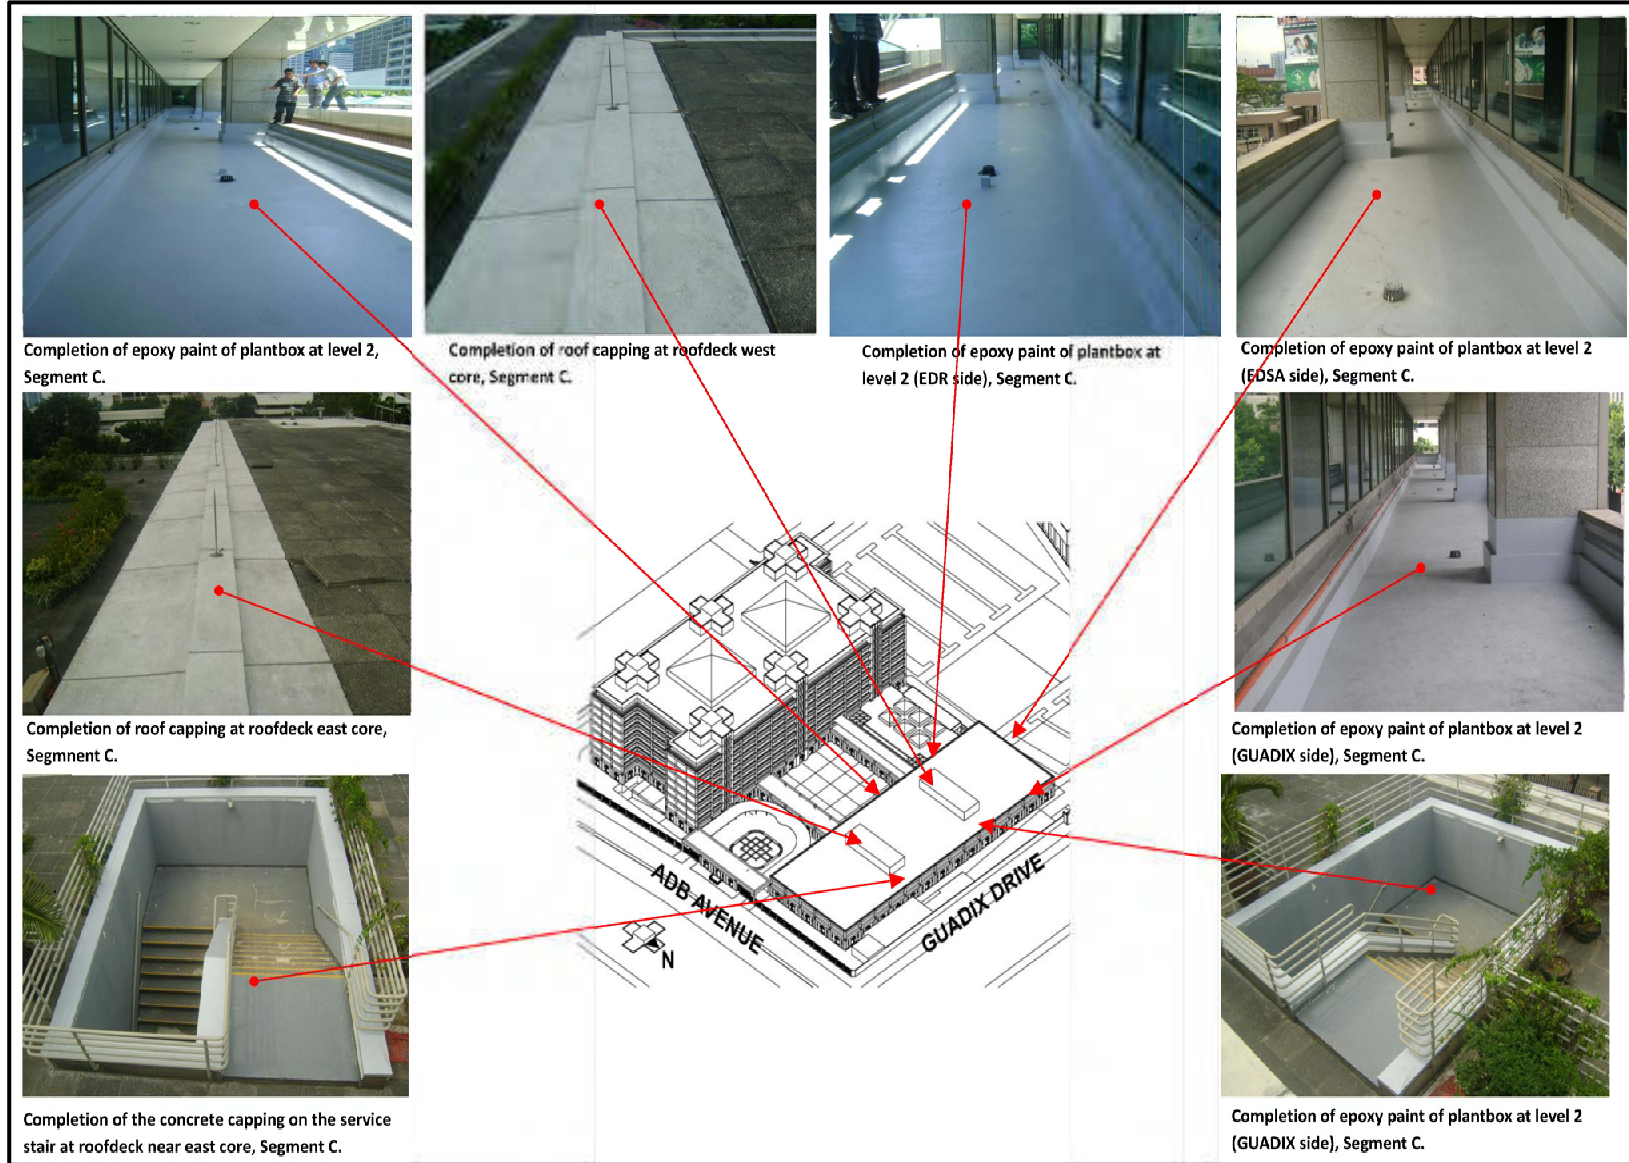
Roof Capping and Lightning Arrester Installation
